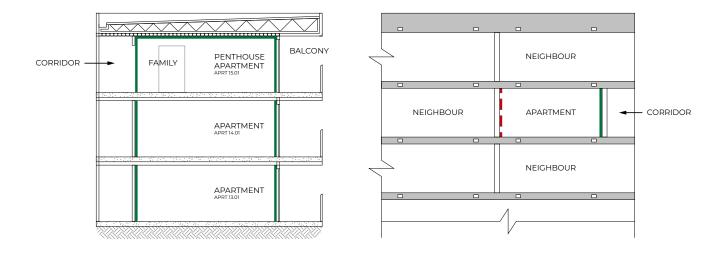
Class 2 & 4 examples of building elements that require thermal bridging to be modelled outlined in solid green lines (as opposed to the dashed red line).
